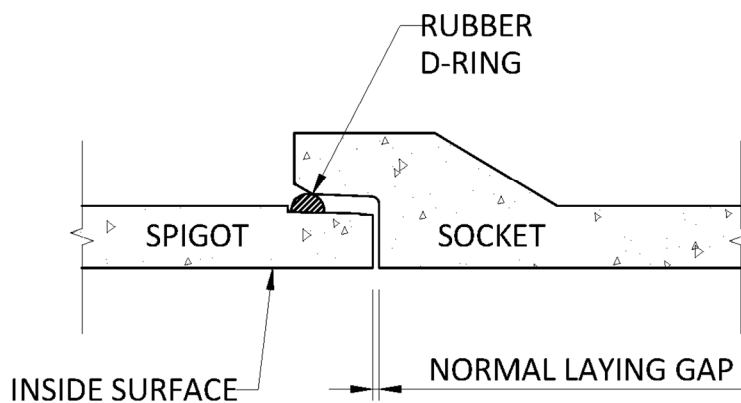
RRJ Pipe with Belled Socket Joint—After
